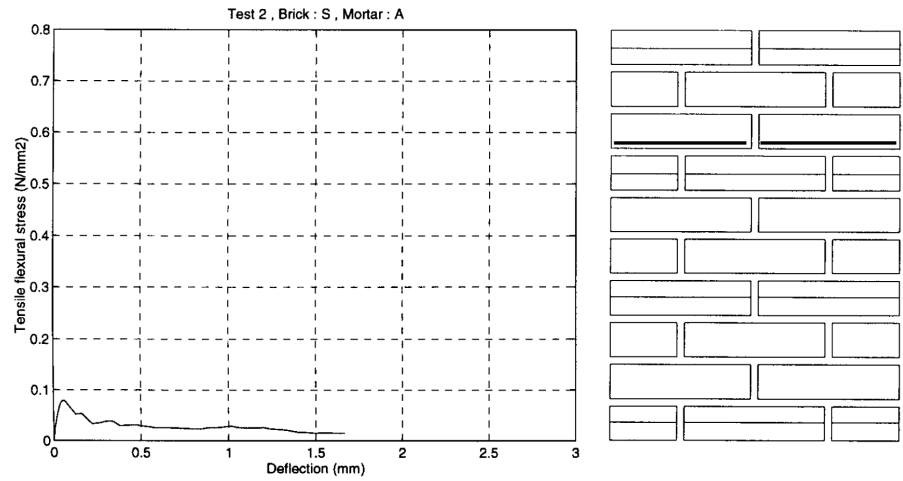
Test specimens used in bending about an axis parallel to the bed joints.
